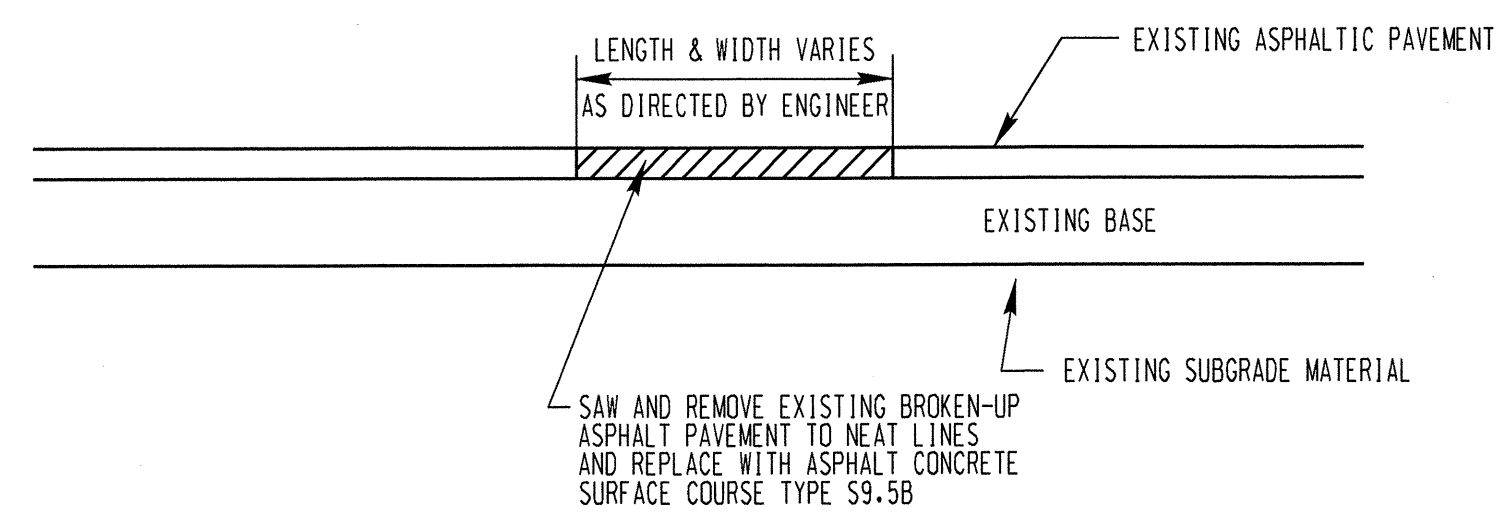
## DETAILS OF REPAIRING EXISTING PAVEMENT PRIOR TO RESURFACING
